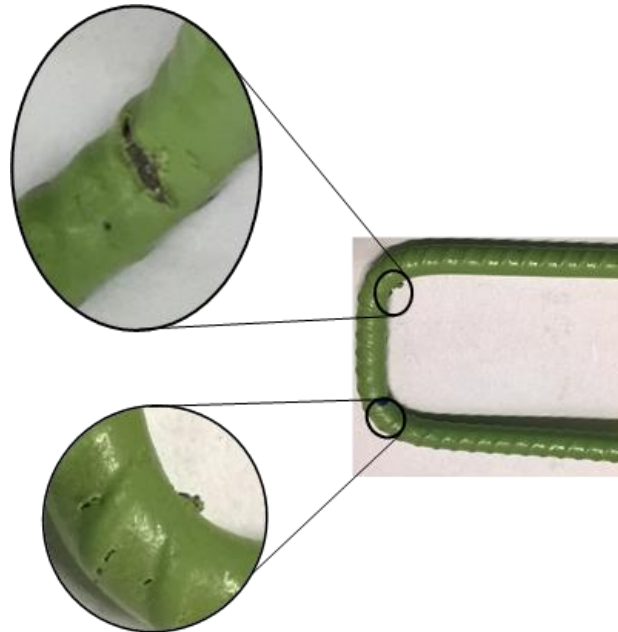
Damage to FBE coating due to bending to 90 ° (instead of 180 ° as specified by ASTM A775)
